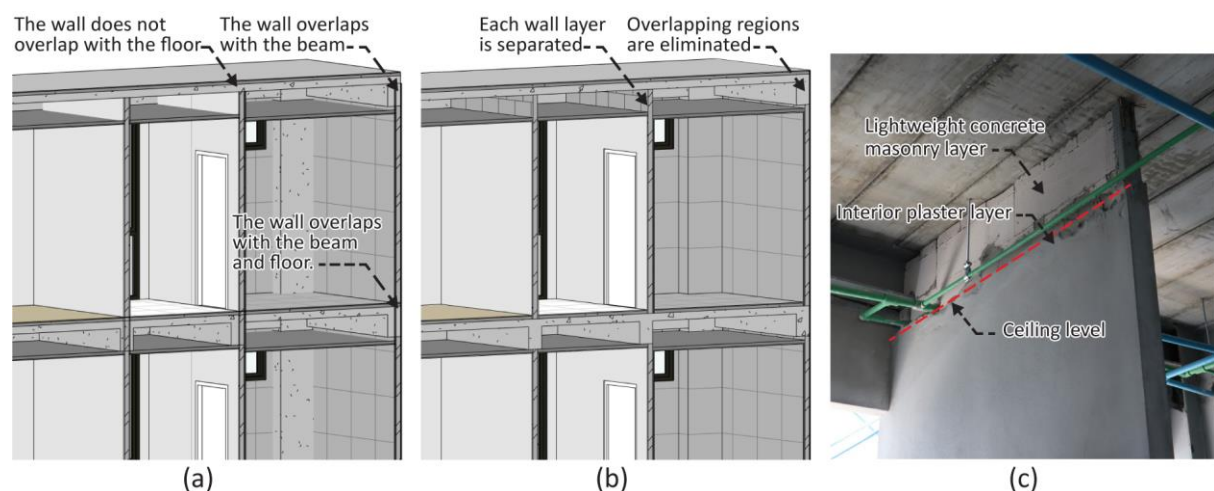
(a) All wall layers in the original BIM model have the same height and overlap with the beams and floors. (b) Walls in the manually modified BIM model after editing and the separation of each wall layer. (c) Lightweight concrete masonry layer and interior plaster layer of a wall in the actual construction.
